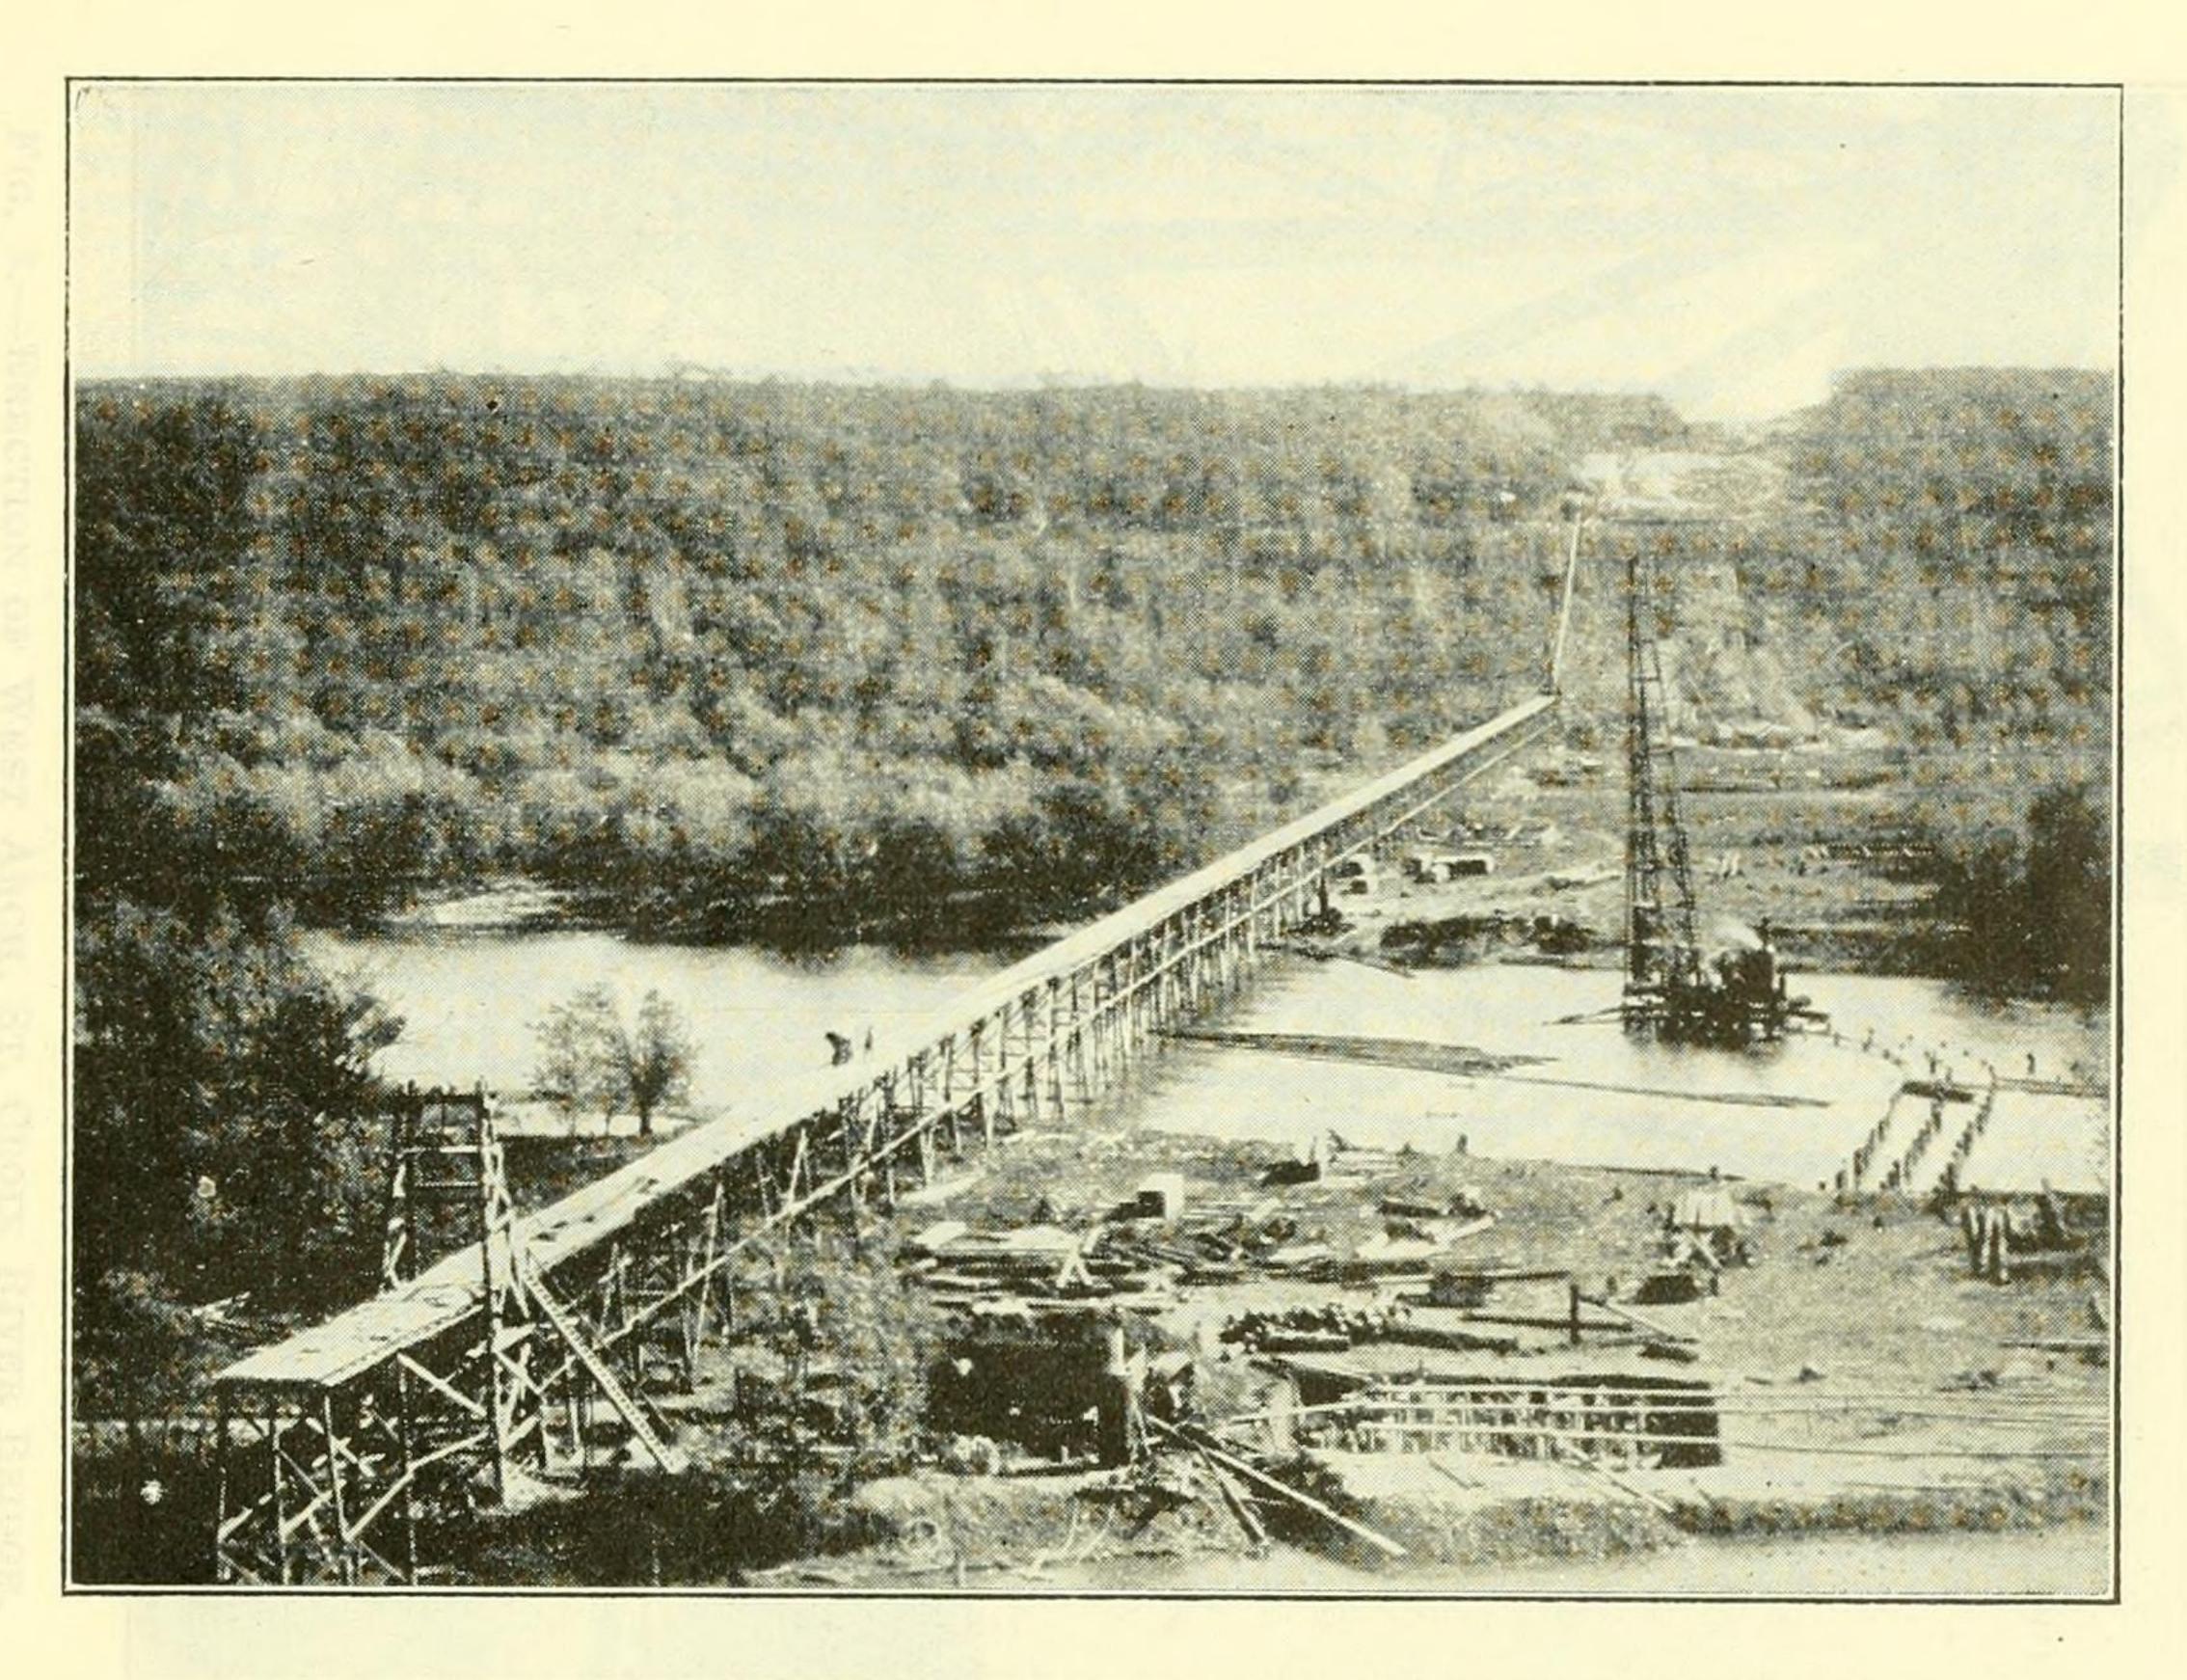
PILE-DRIVER, AND TRESTLE FOR HANDLING CONCRETE.
